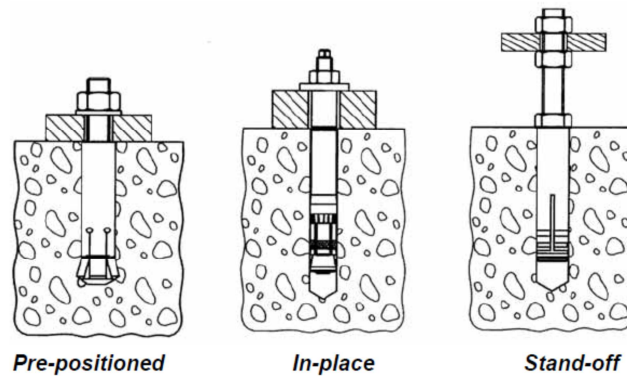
Setting configurations for post-installed anchors (Eligehausen 2006)
